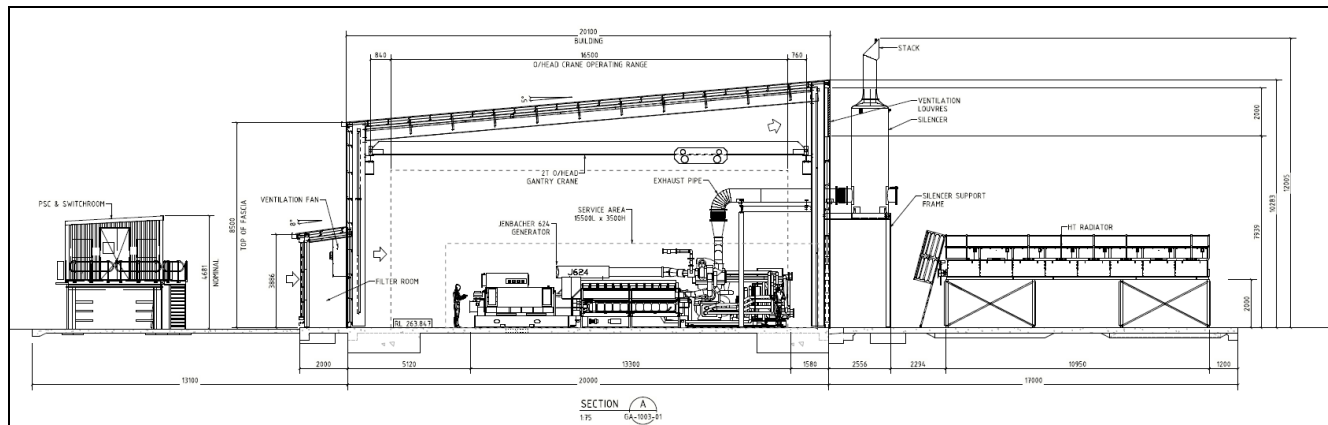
Elevation plan for proposed skillion roof power generation facility
